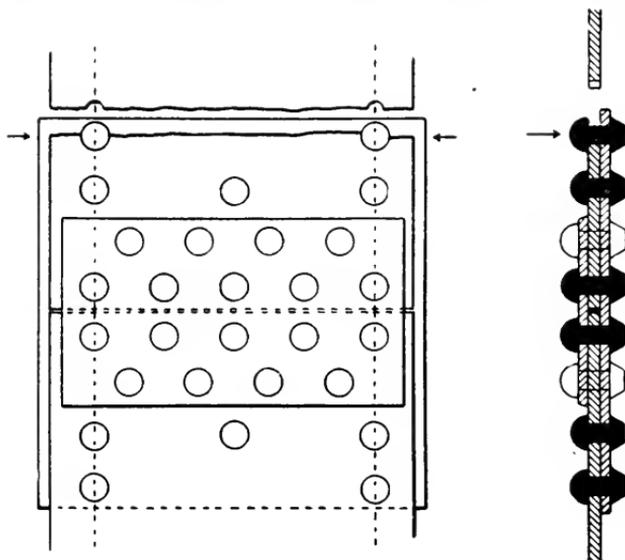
FRACTURE THROUGH OUTSIDE ROW OF RIVETS.
